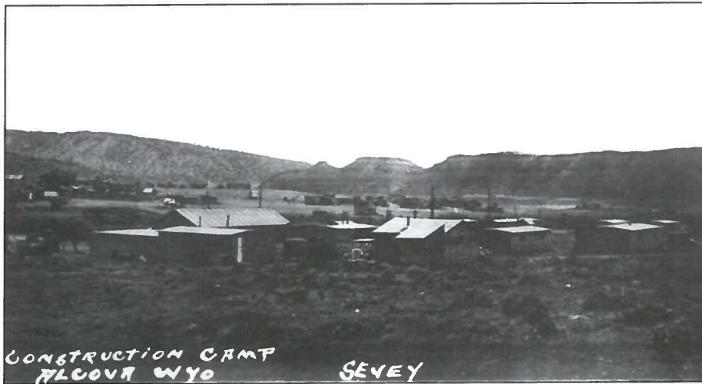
(left). Construction camp at Alcova townsite, circa 1930s. View to east from bridge over North Platte River.
